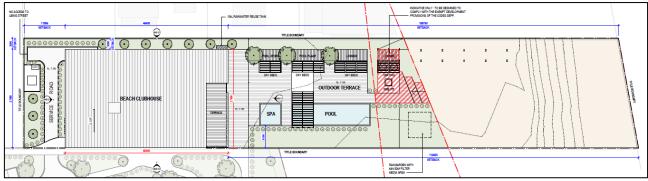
Site Plan Indicating Zoning Boundaries (VIA Architects)
